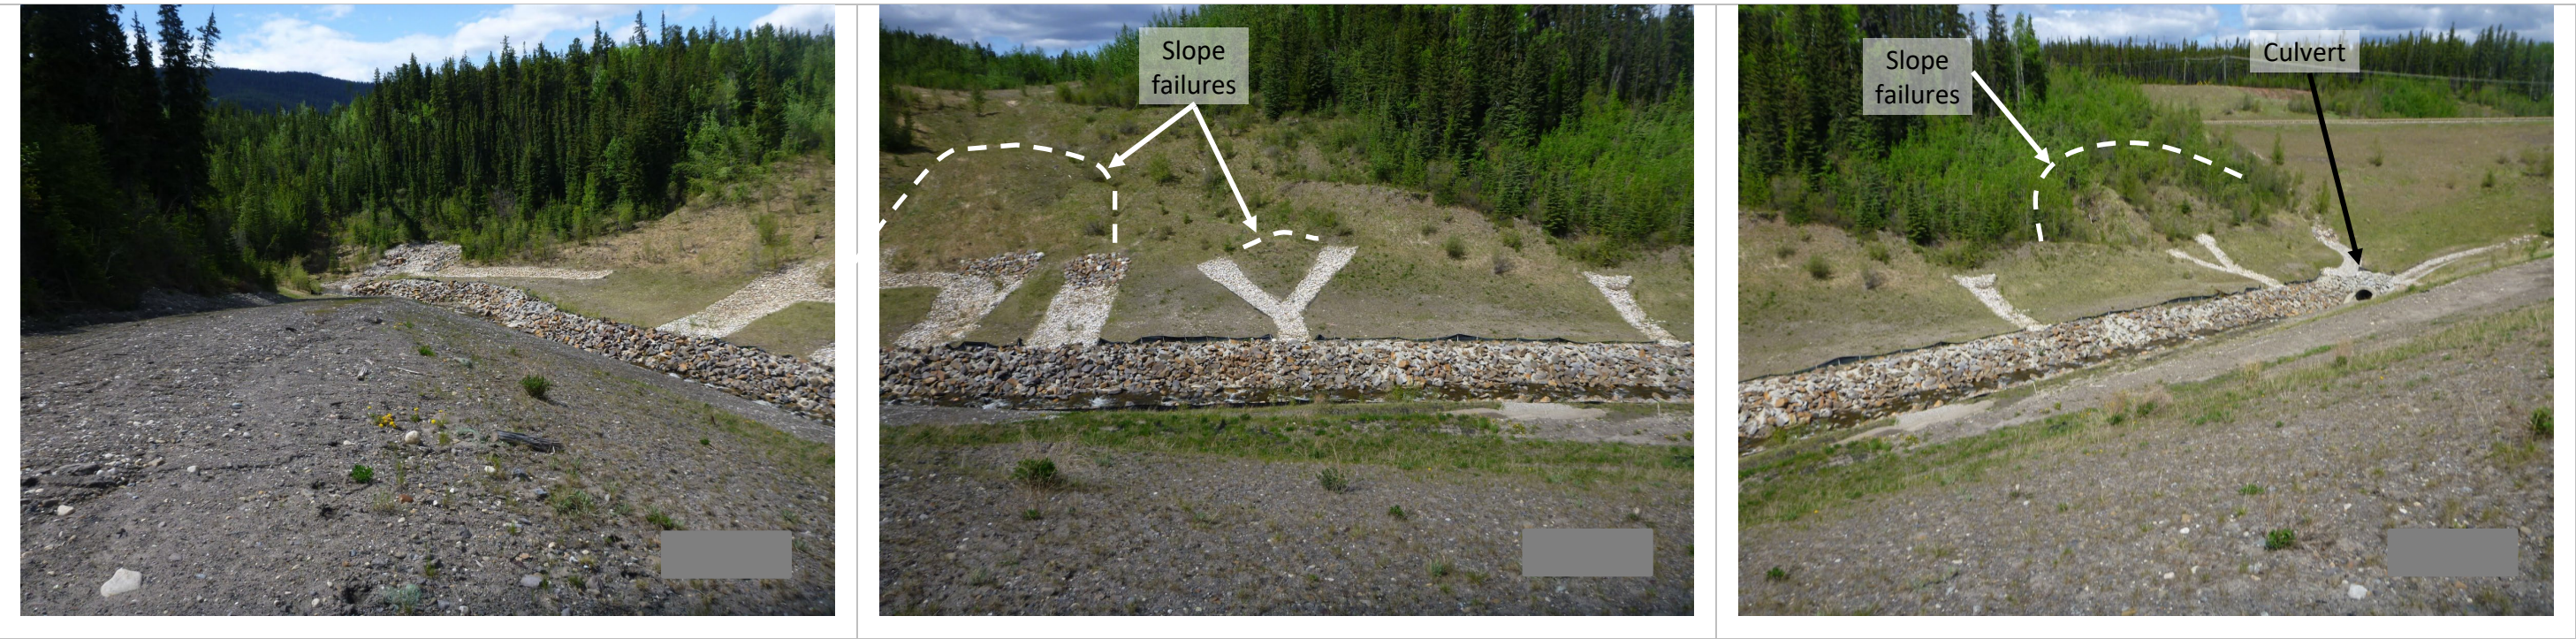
South slope of Hwy 40:34 embankment. Photo taken June 2, 2025, facing northwest.
